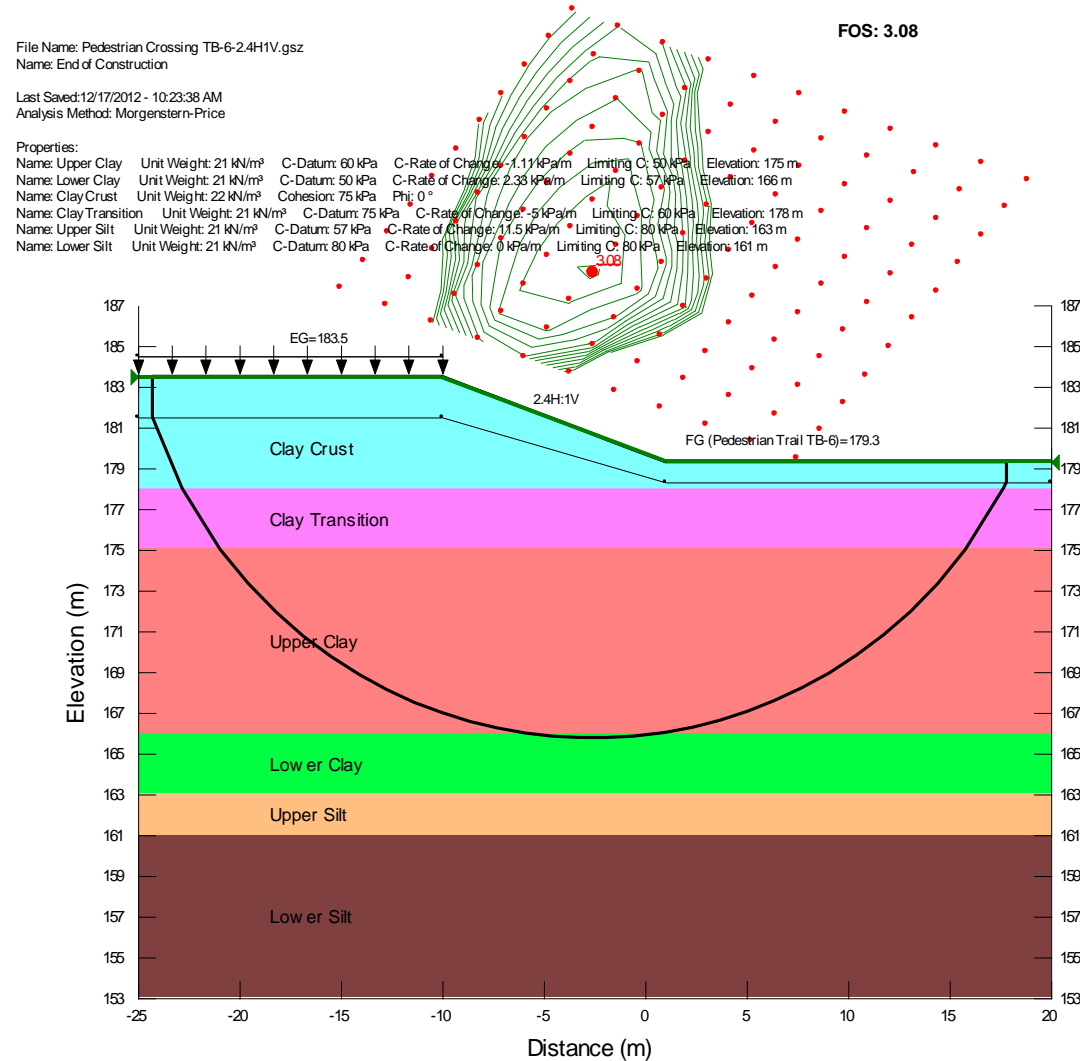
Global Stability Result – Wing Wall (Maximum Section) – End of Construction (Undrained) Loading
